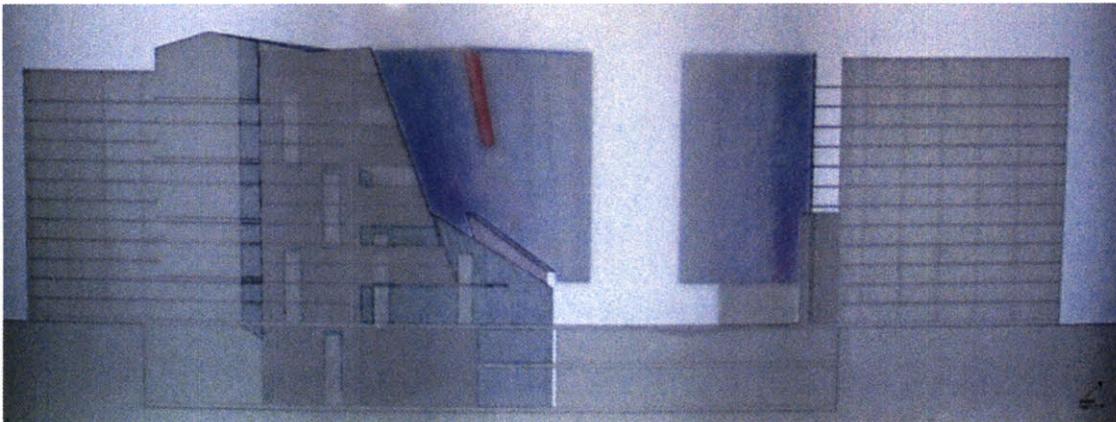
section showing design of downtown crossing: watercolor on mylar mounted on plexiglass
